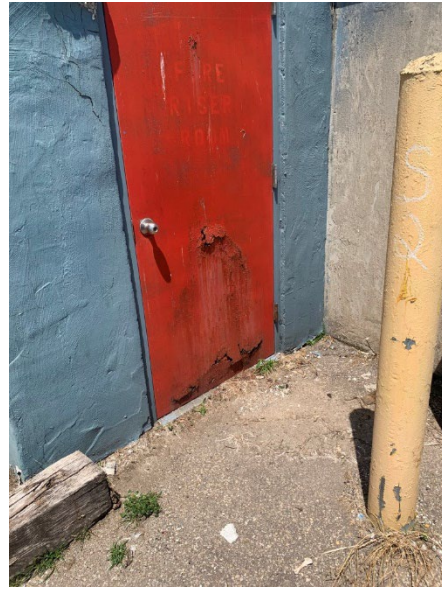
Hollow metal door has failed with sever corrosion and holes in the door.
